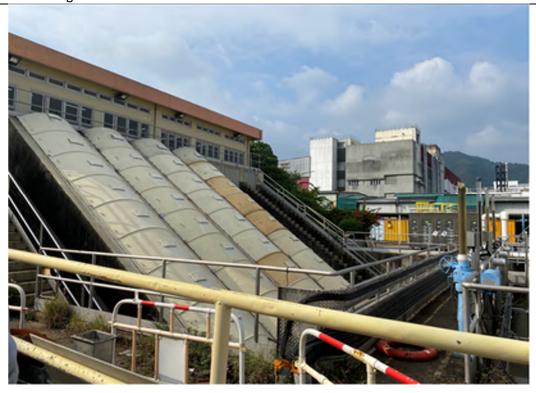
Inlet Pumping Station of West Plant (External view of Screw Pump) – The Screw Pumps are located on concrete paved floor at 3.4 m above the ground level. All accessible concrete surfaces around the pumps are in good condition with no oil stain observed.
